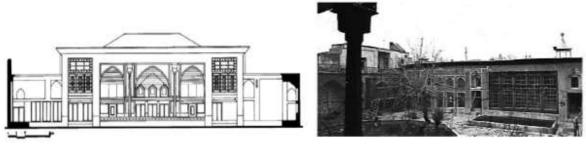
Elevation and photo of Sheikh-ul-Islam house
